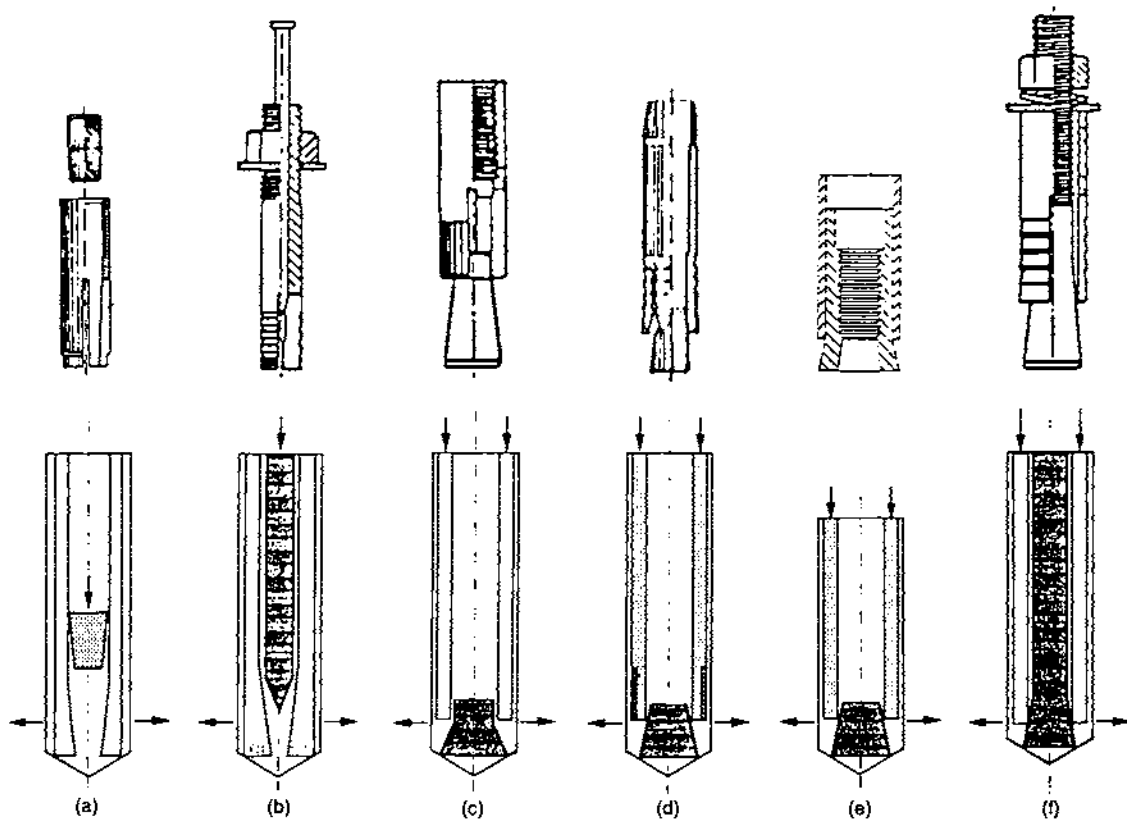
Design and operation modes of metal deformation-controlled expansion anchors: (a) cone-down type ('drop-in anchor'); (b) shank-down type ('stub anchor'); (c) cone type; (d) cone type ('self-drill anchor'); (e) lead caulking anchor; (f) plug-bolt type. (Reproduced by kind permission of Comite Euro-Internationale du Beton/Thomas Telford Services Ltd. from the CEB report 'Fastening to concrete and masonry structures'.)
